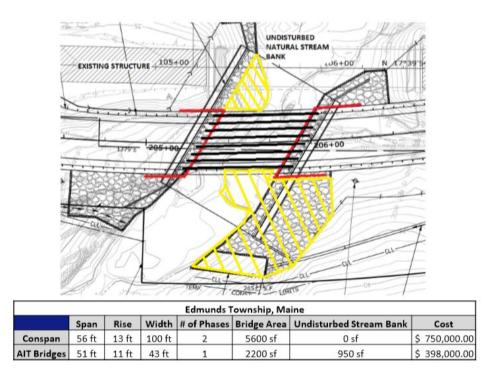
Comparison between AIT's CFFT bridge and Con/Span's precast concrete designs.
